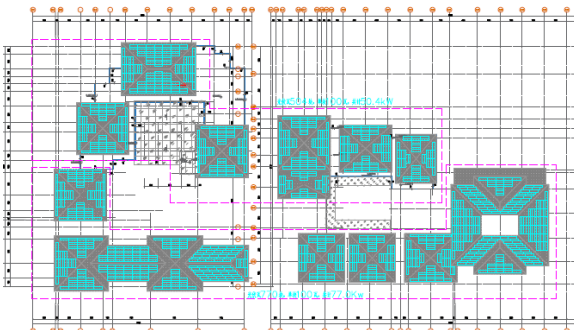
Photovoltaic (PV) Panels Roof Layout Plan
